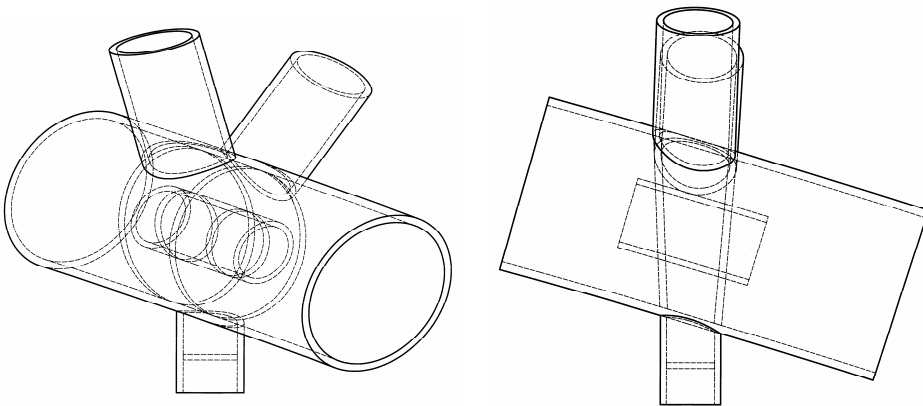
Detailing of nodes of Woluwelane Bridge.
